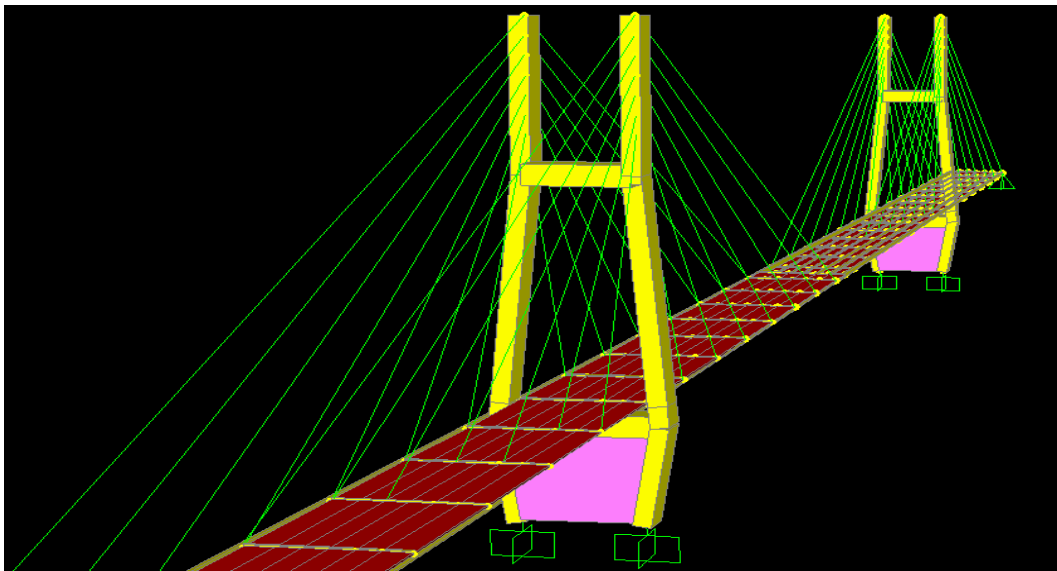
Extrude 3D view of the bridge with H-shape pylon
